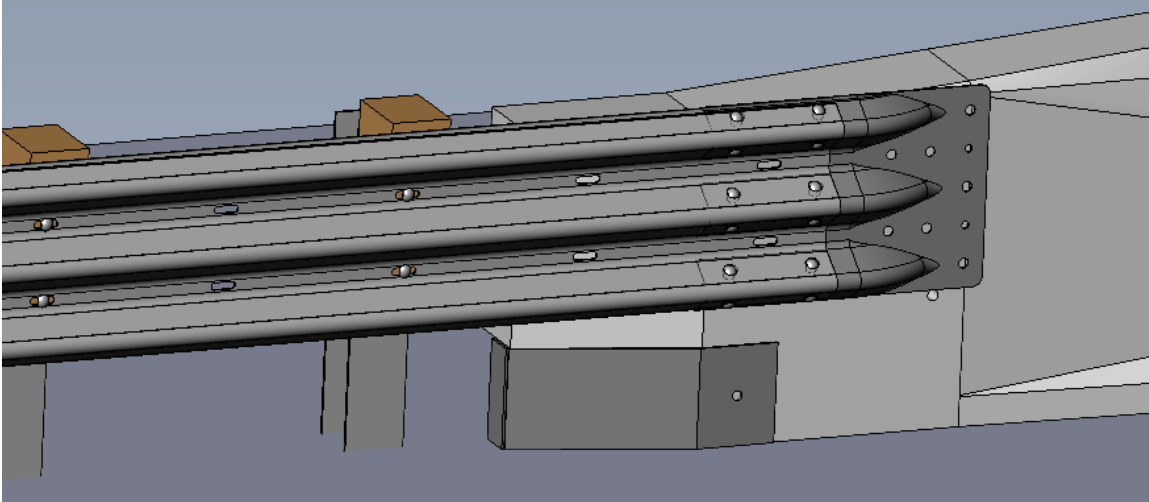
Option 2, Steel Assembly Placed on Buttress 8
